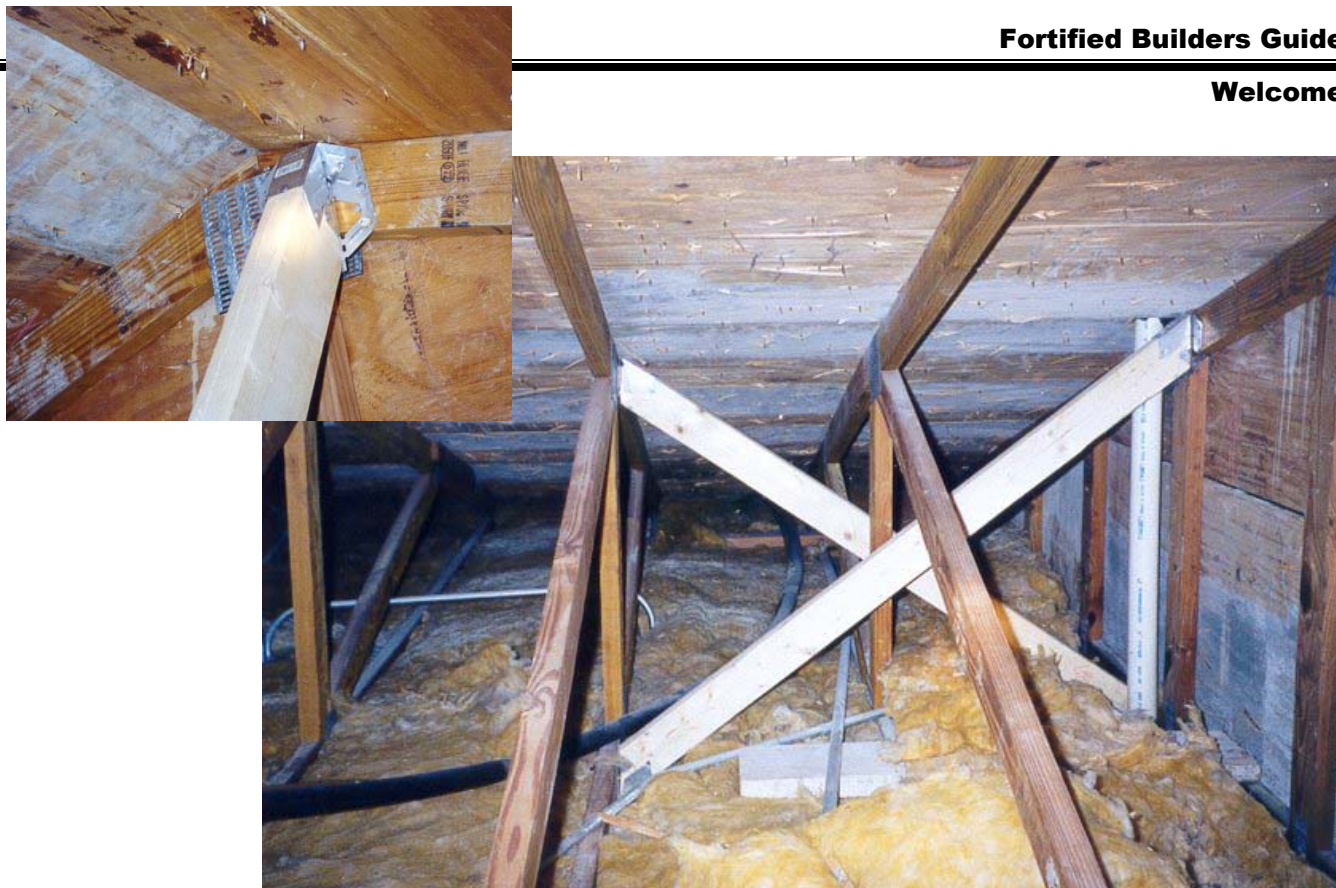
Gable End Wall Cross Bracing. [Inset: Cross Bracing should connect to truss as close to the sheathing as possible. In this case, a special metal connector was used to make installation easier in existing attic] Top and bottom chord bracing not shown.
